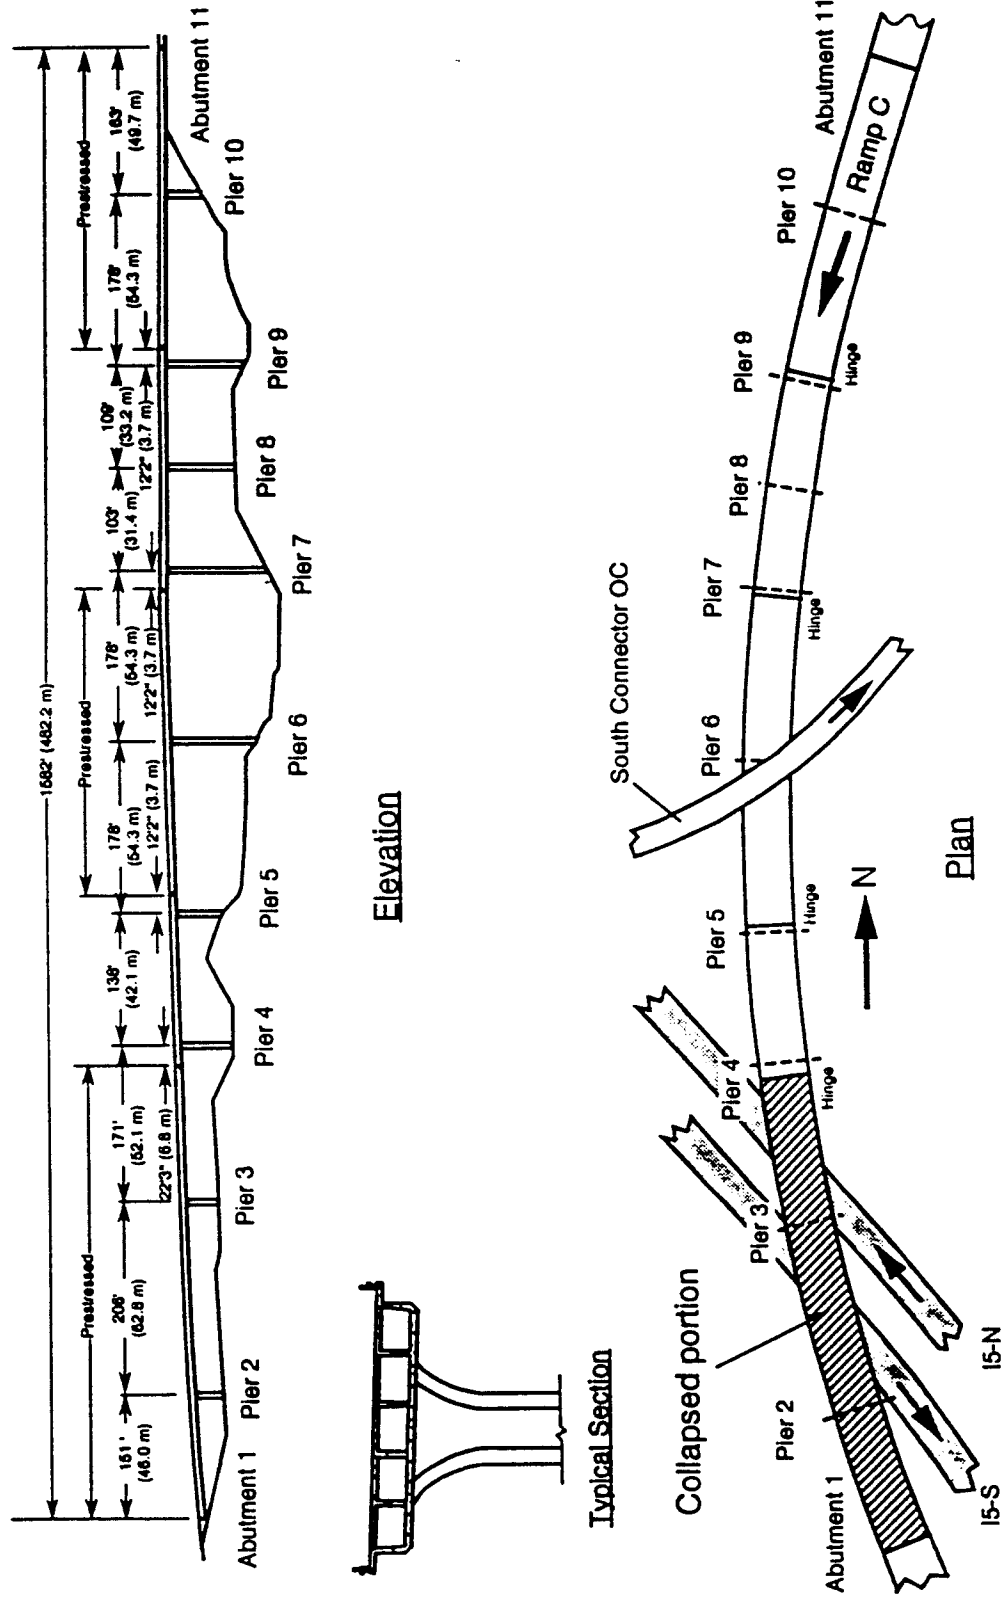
Plan and Elevation Views of the SR 14/I5 Separation and Overhead, Ramp C (Todd, *et al.*, 1994)
